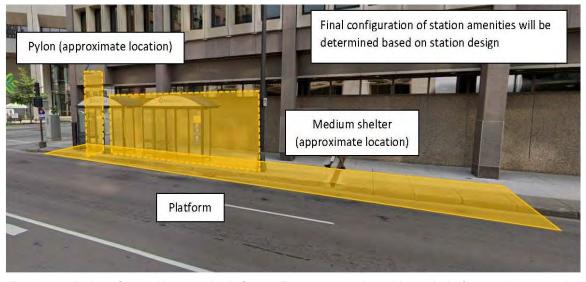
Robert Street North and 6th Street East proposed northbound platform adjacent to the Minnesota Department of Economic Security Building.
